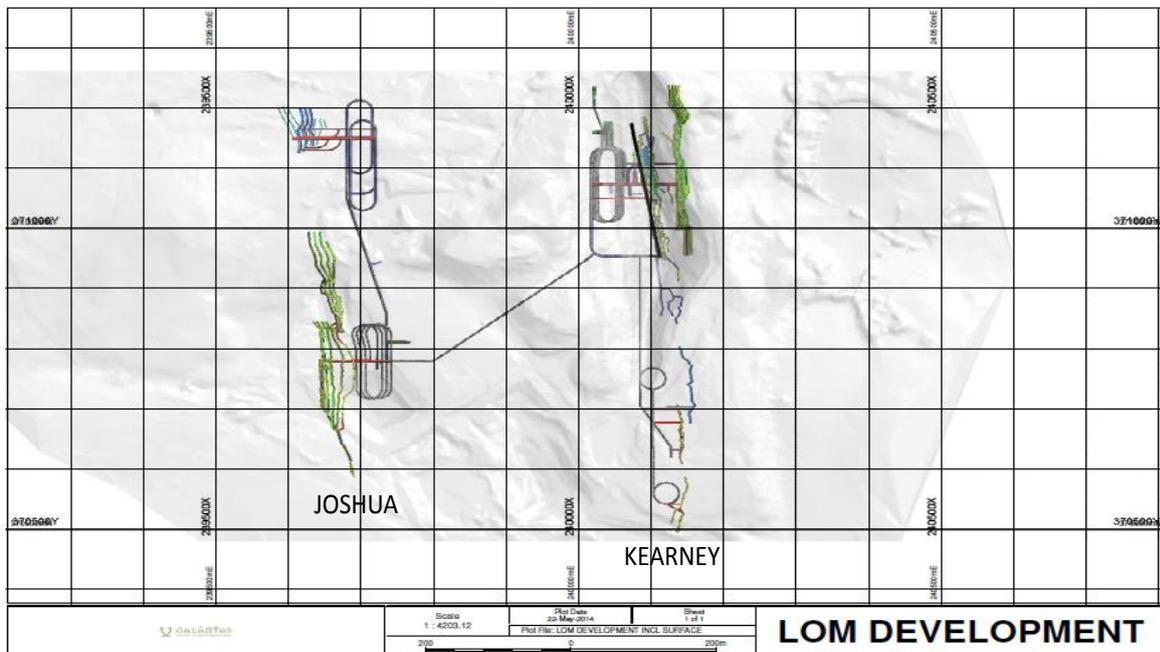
PLAN VIEW OF MINE DEVELOPMENT
